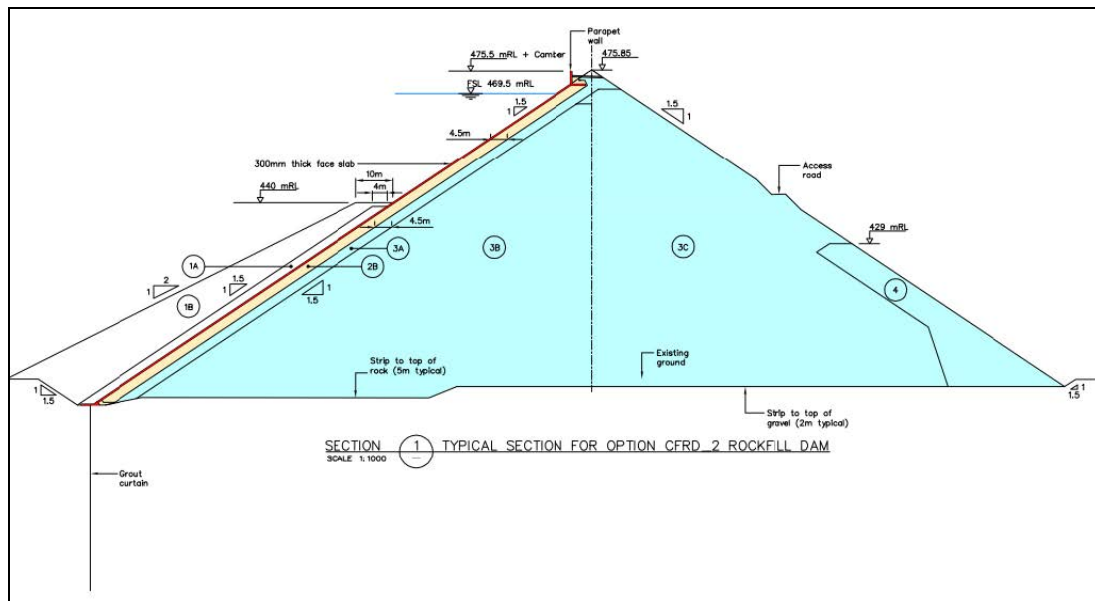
Cross-section of the Proposed Dam³⁸⁵
